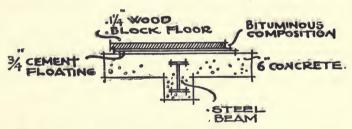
Plan of Construction of Floors that should be adopted for Schools.
